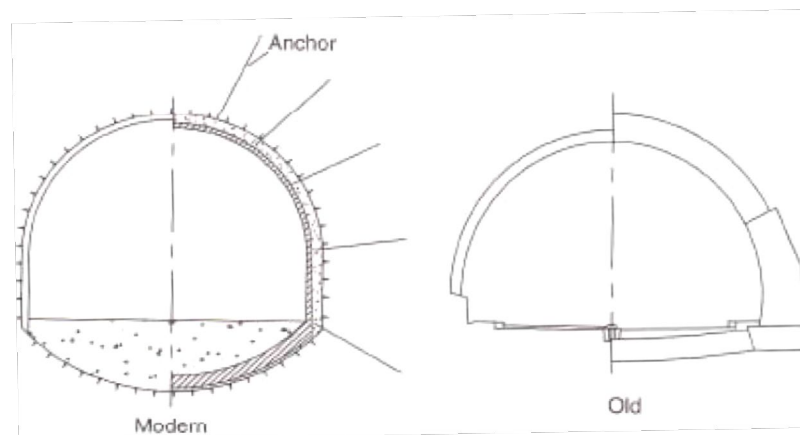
Additional support should be provided by wire mesh, steel arches and anchors not by increase of concrete liners (Müller, 1978),
